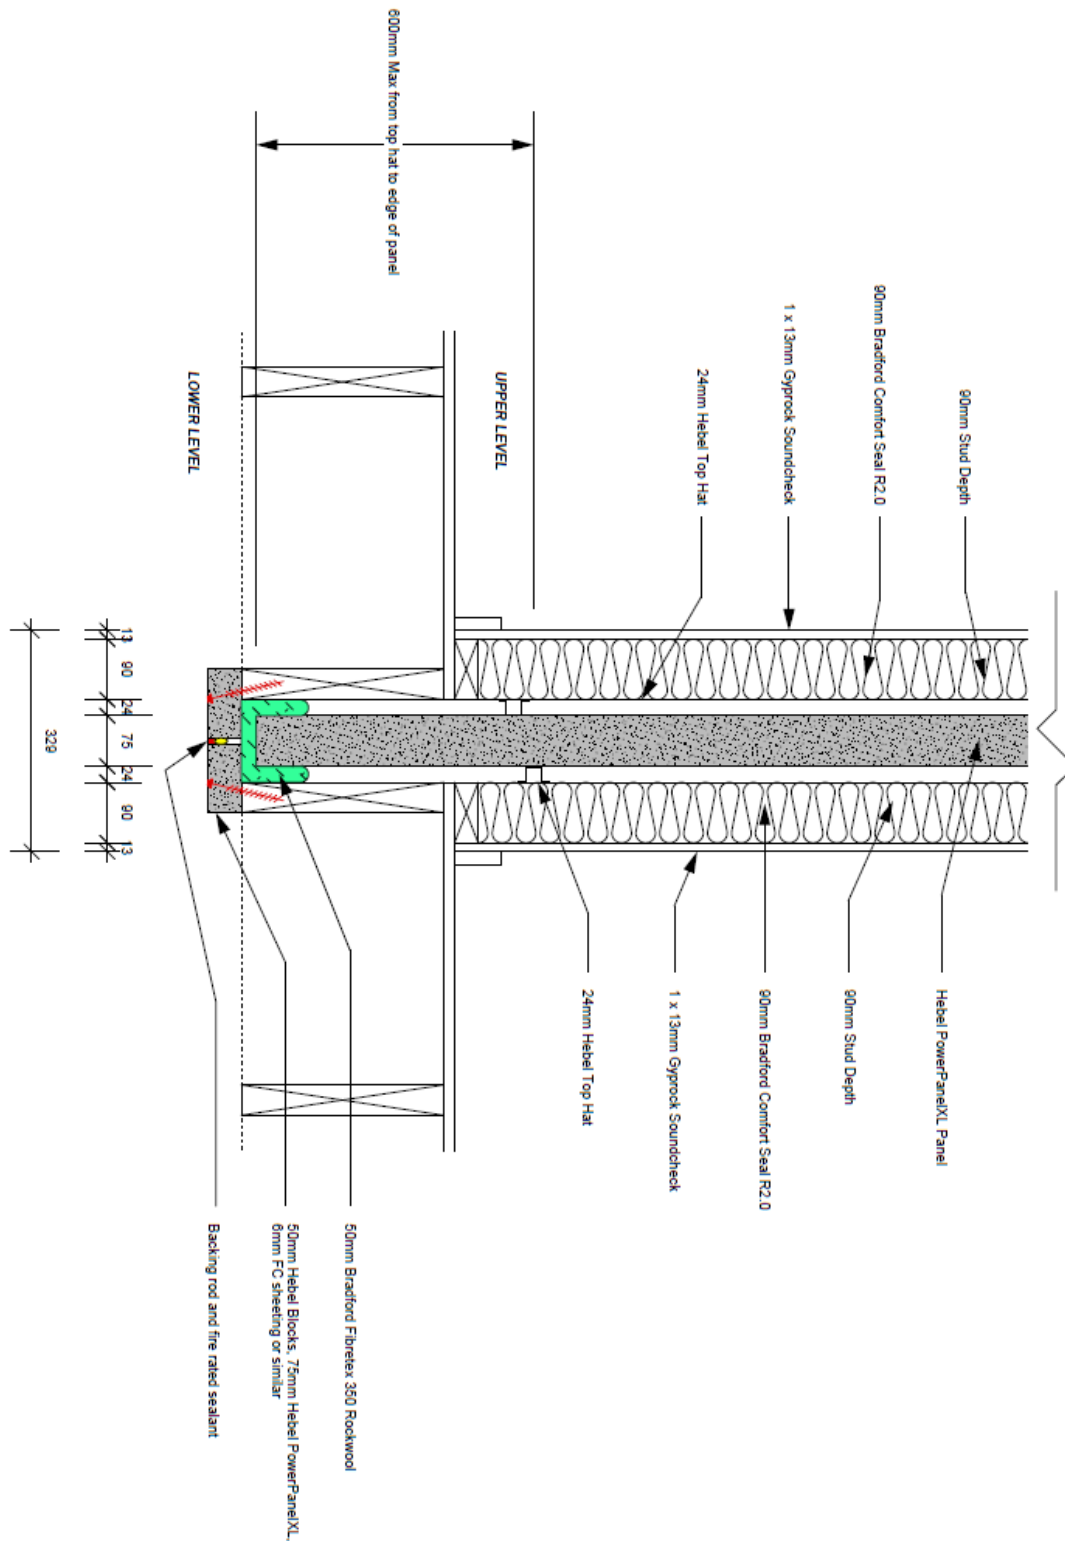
Façade cross-sectional elevation of non-discontinuous Hebel party wall overhang
